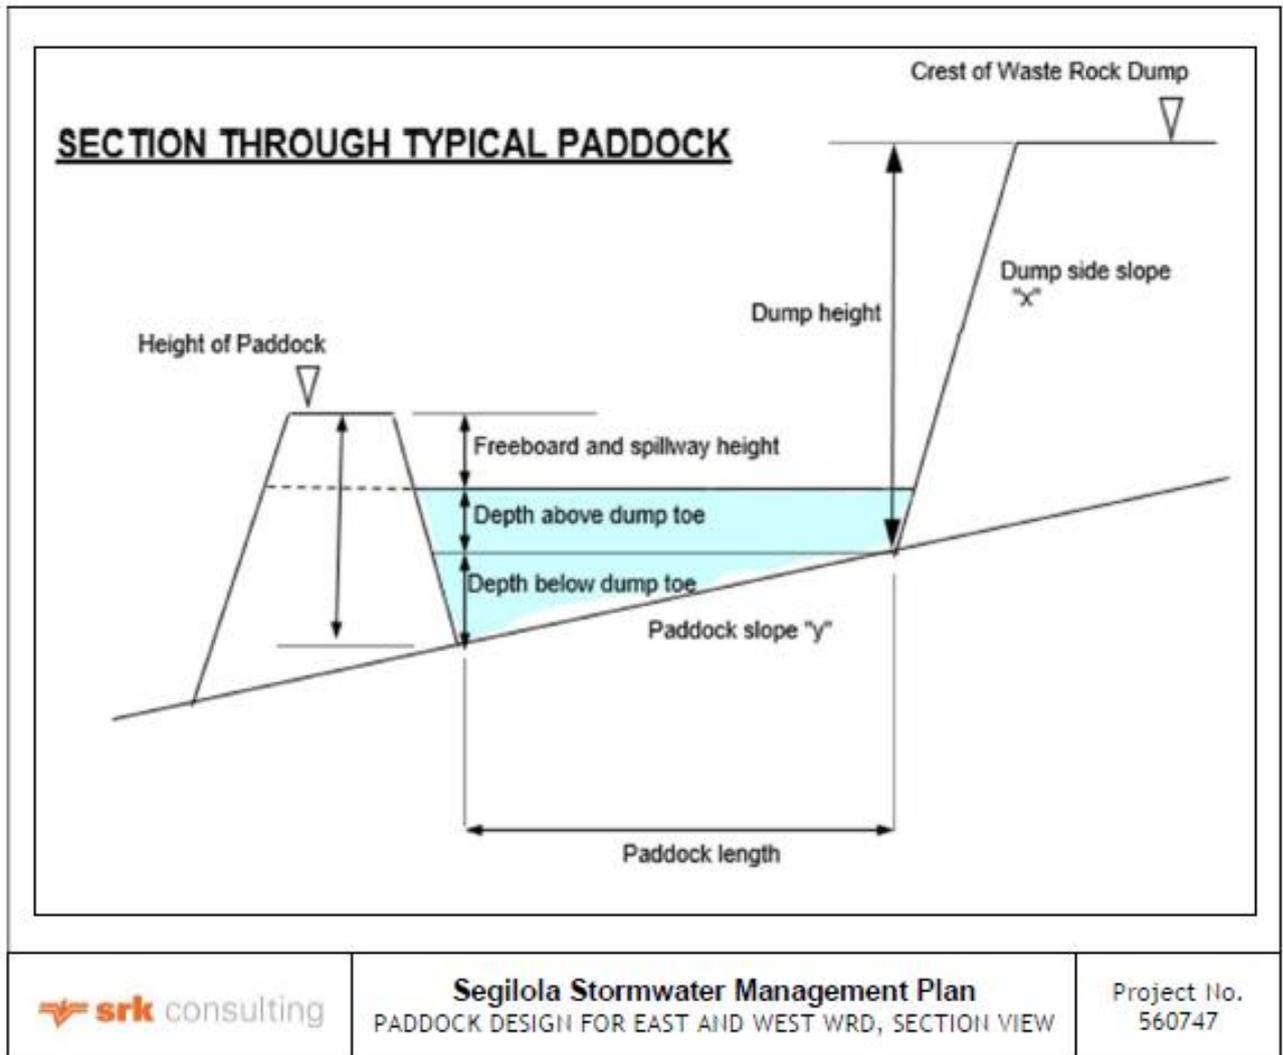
Paddock Design for East and West Waste Rock Dump, section view
